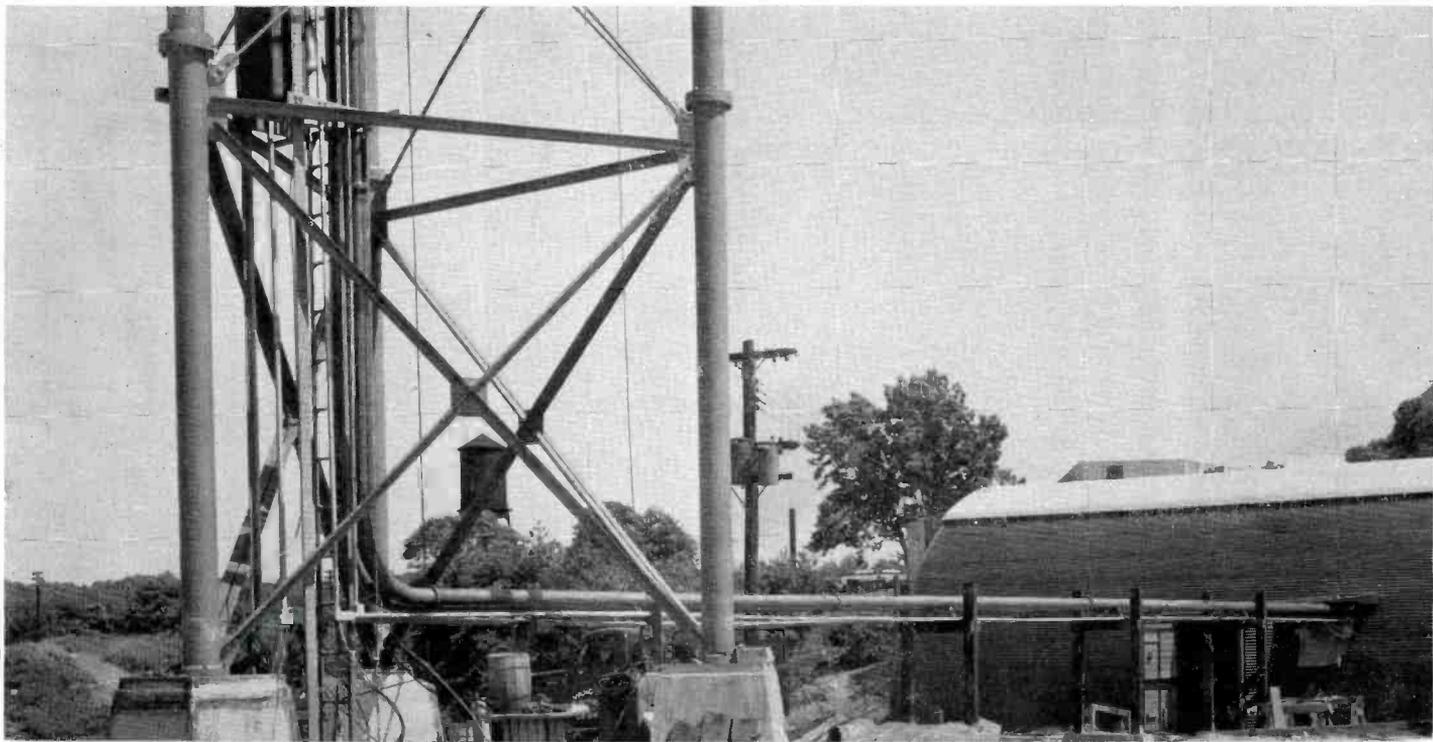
The transmitter building is a modified Quonset, painted dark green and provided with brick trim which gives it a modern and pleasing appearance. In addition to the transmitter room it houses office, work shop, kitchen, storage space and rest room.
